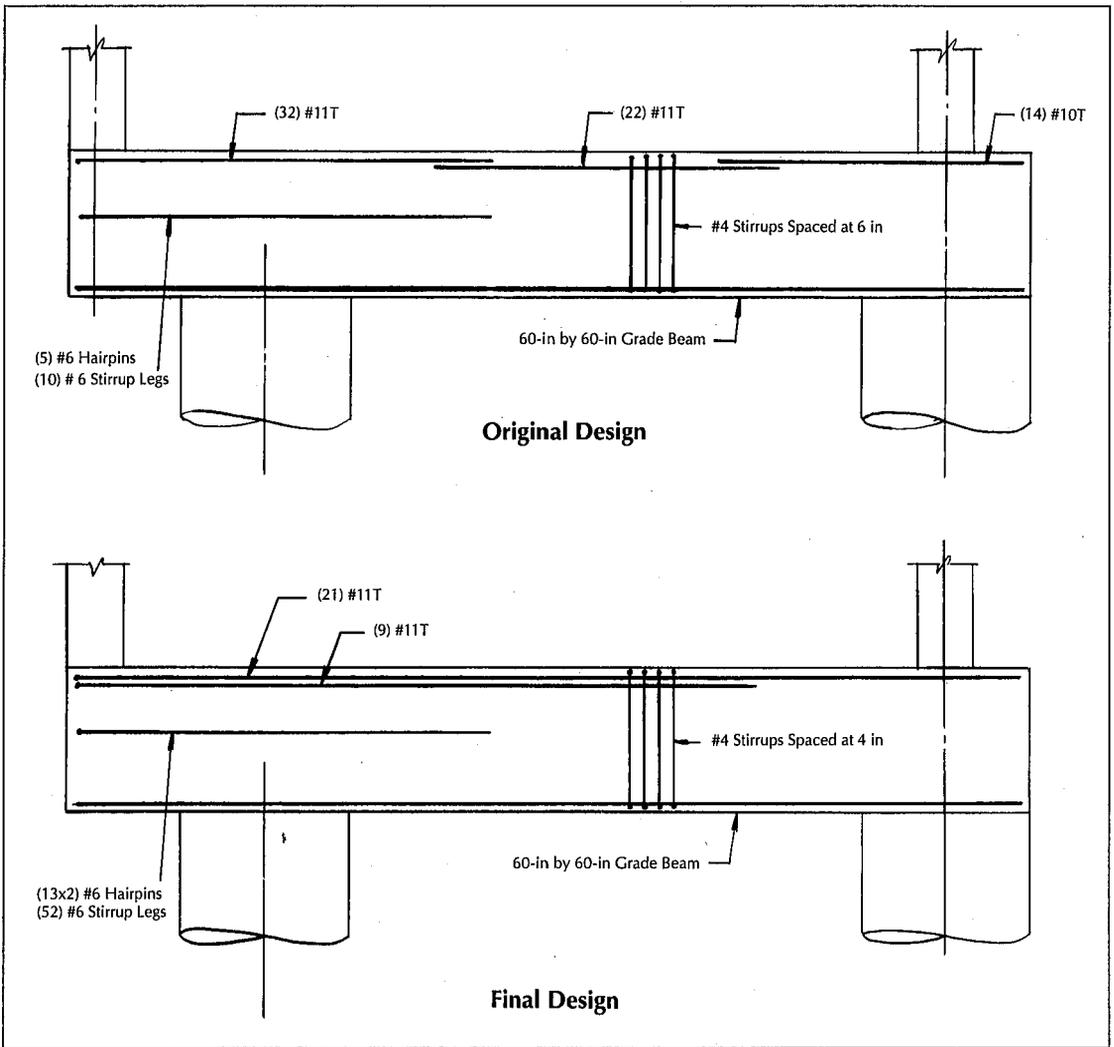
Cantilever grade beams were redesigned to correct inadequate stirrups and lap splices.
